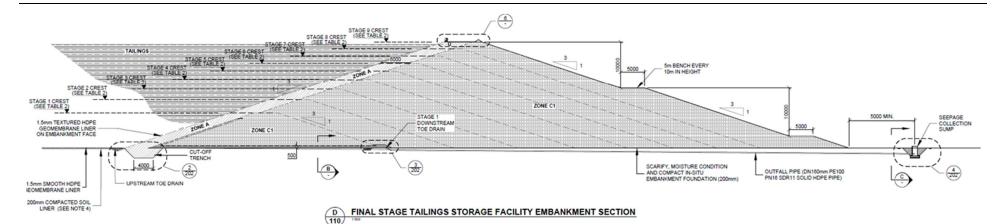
Typical Embankment Cross Section (KP, 2022b)
